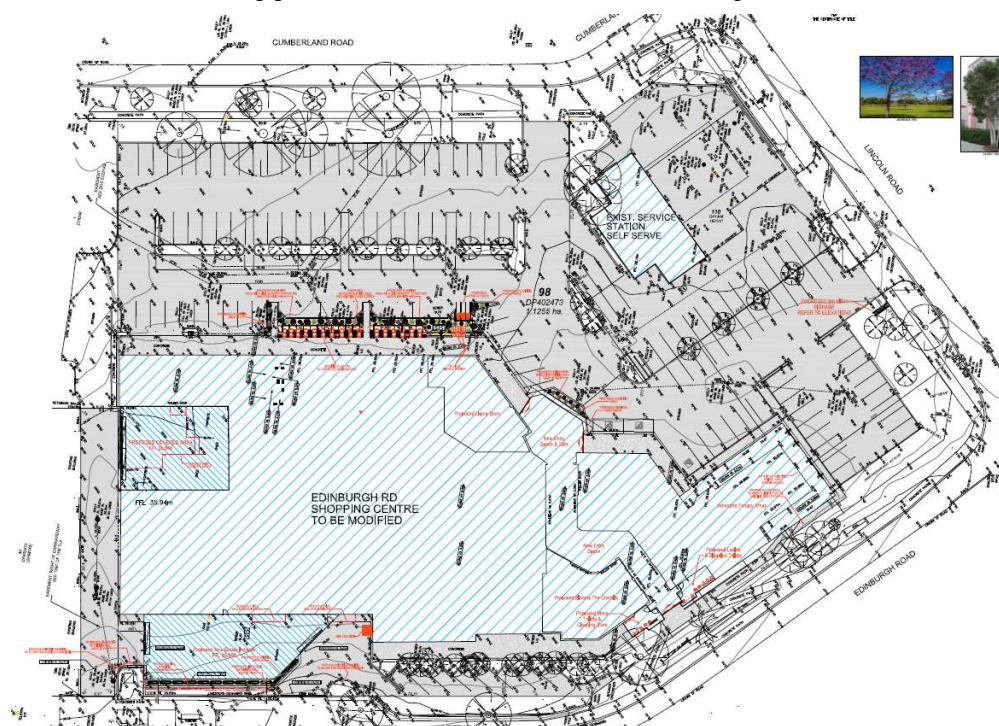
Proposed Shopping Centre Reconfiguration and Expansion
